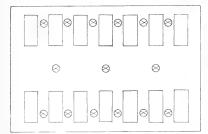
Typical Sole-Cutting-Room Layout. ⊗=75-Watt Mazda C Lamp in RLM Standard Dome Reflector.
